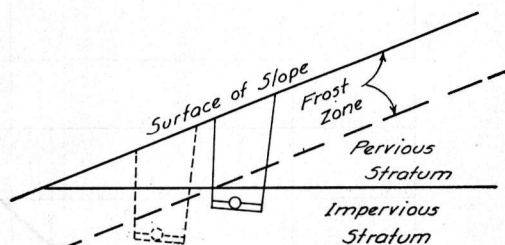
Trench on right can receive seepage from pervious stratum before it reaches frost-zone. Trench on left would be too far downhill.
